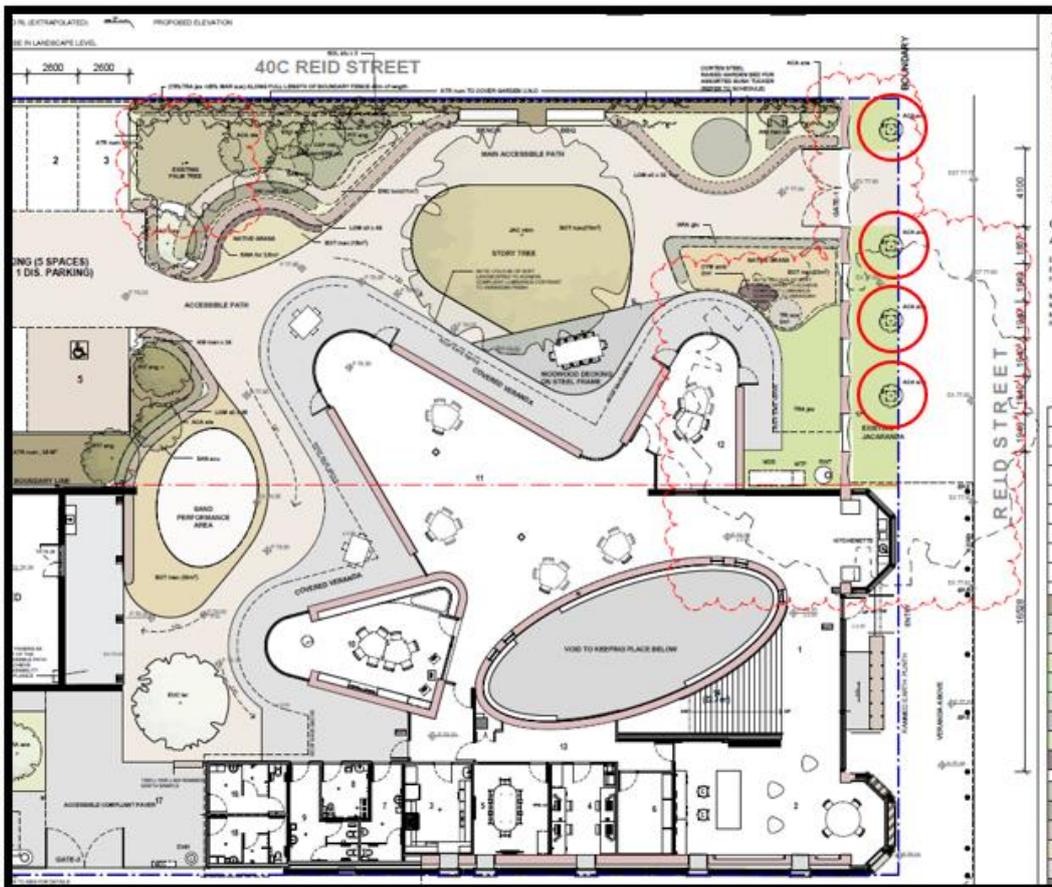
Proposed decking and façade wall encroachment into the TPZ & SRZ of Tree 1.
